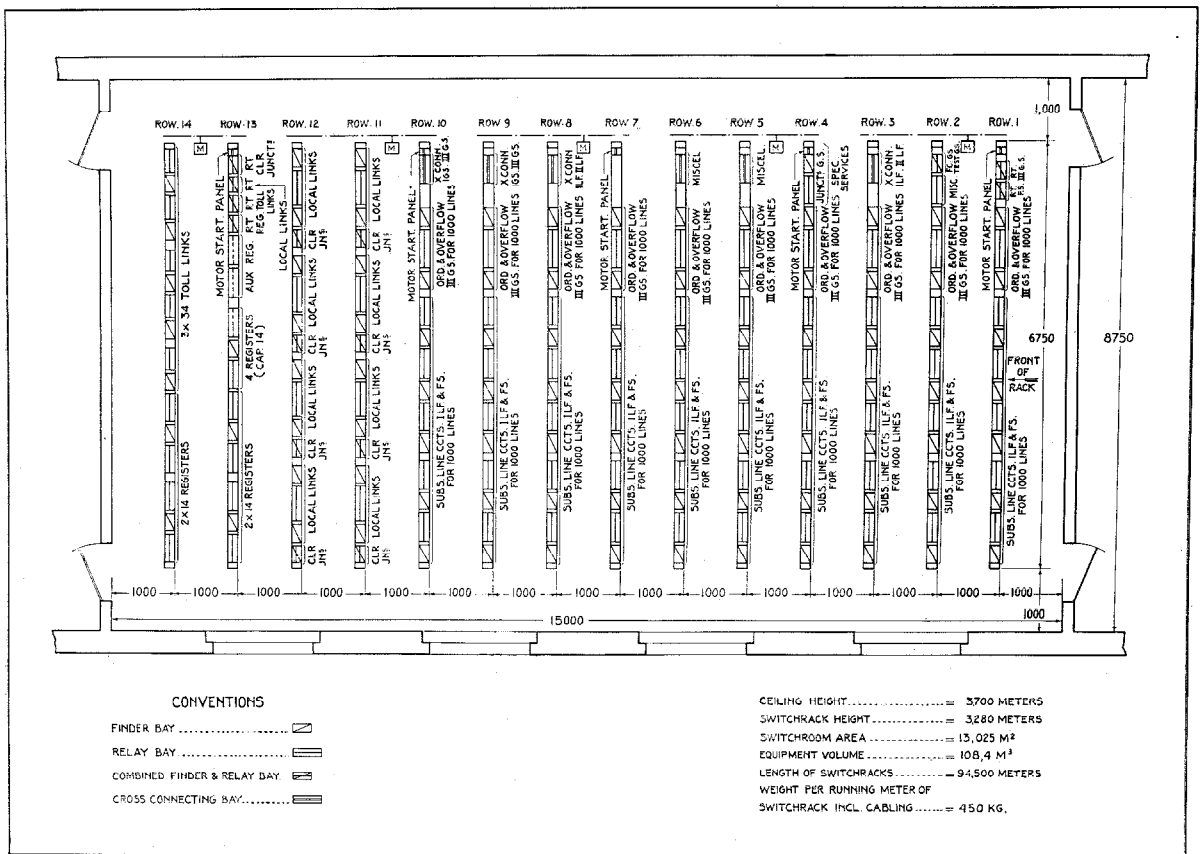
Typical Floor Plan 10,000 Line Exchange. (See Fig. 20).
